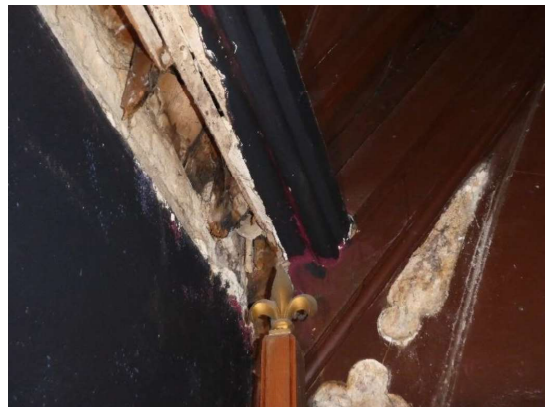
Showing typical painted timber rafter detail within the main theatre.
